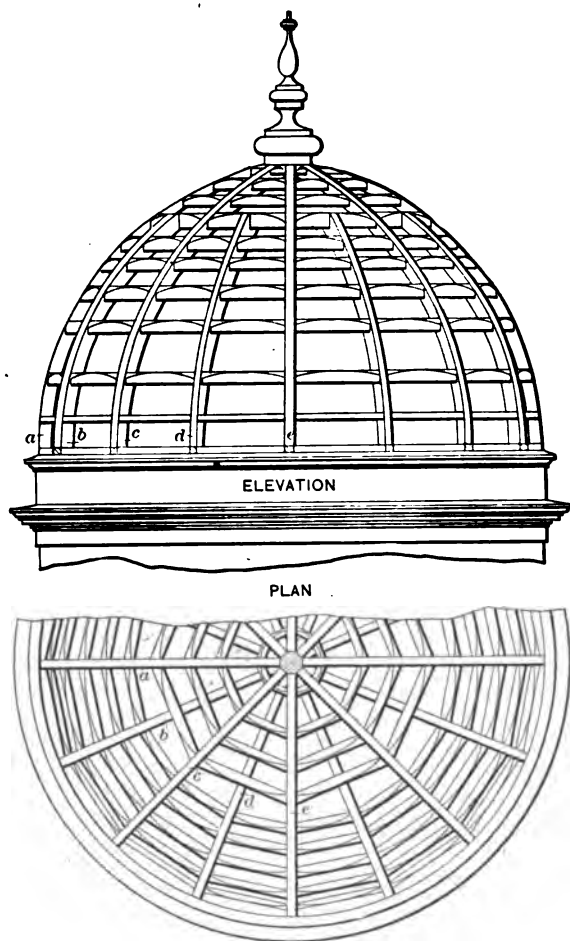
Framing Plan and Elevation of Hemispherical Dome.
